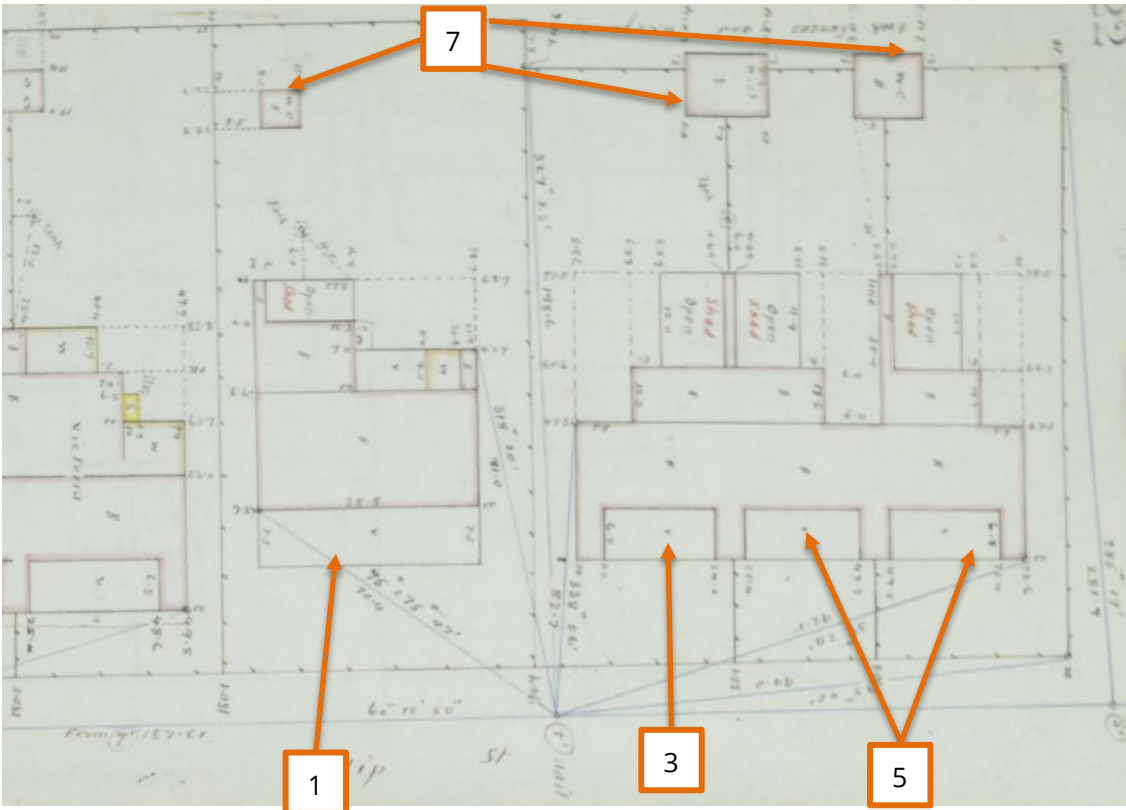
Sydney Water Field Book plan of Lots 28, 29 and 30 Parraween Street dated to 1892, with the study area outlined in orange (Source: Sydney Water Archives, PWDFB2133 p. 22)
